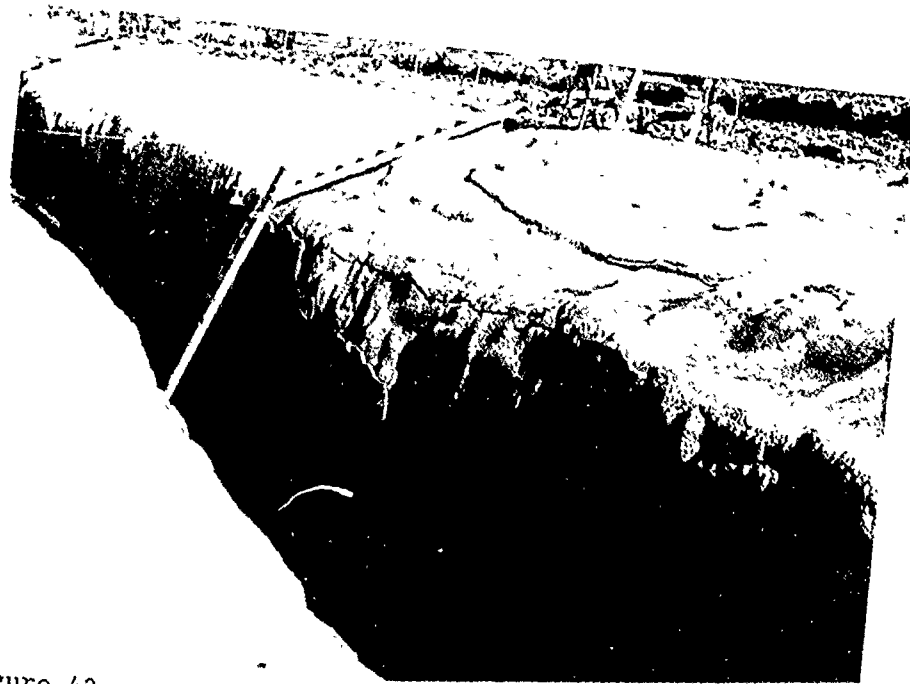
Failure of gunite on hydropower conduit excavation.
